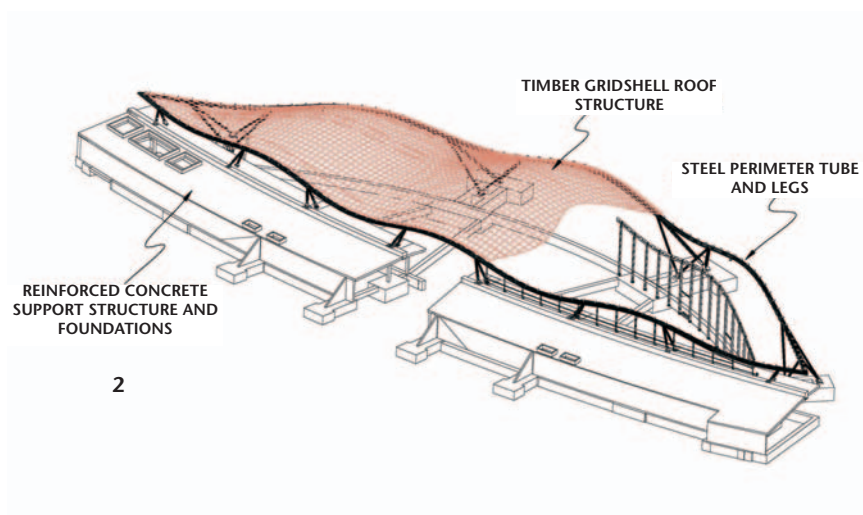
Building structural layout / Fig 3. Timber gridshell roof
